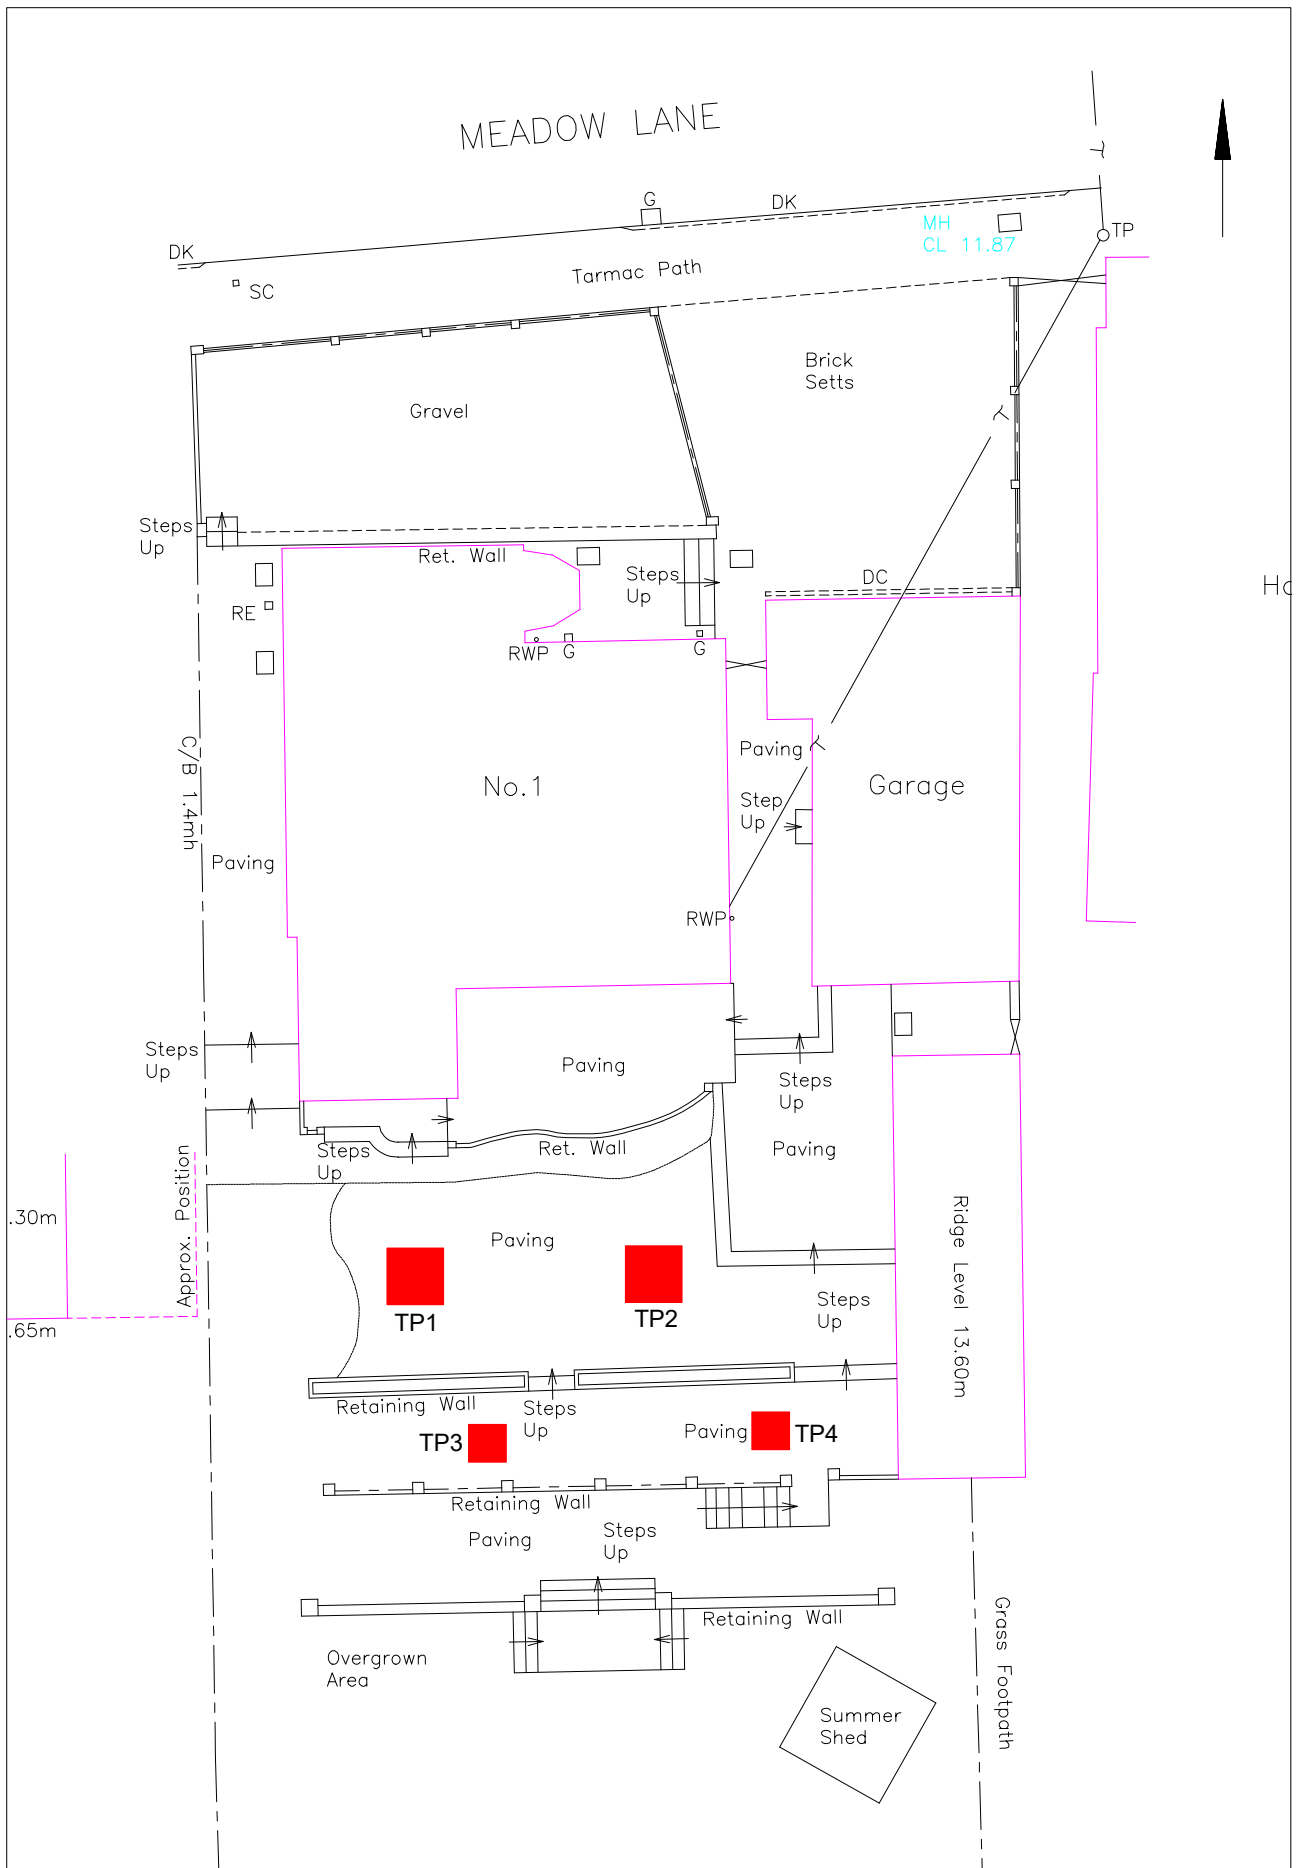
Proposed test pit locations and site constraints (adapted from ADP topographical survey).
